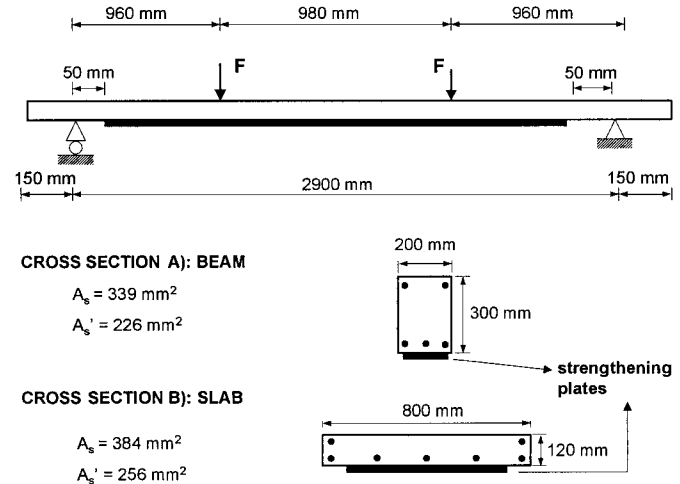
Specimen Geometry and Test Layout for Beams Tested by Zarnic et al. (1999)
